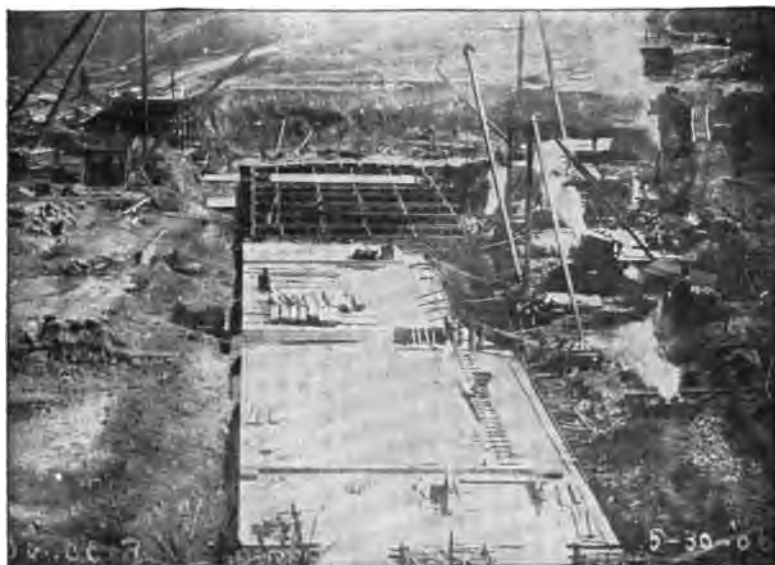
FLOOR CONSTRUCTION, JUNIATA DAM.
